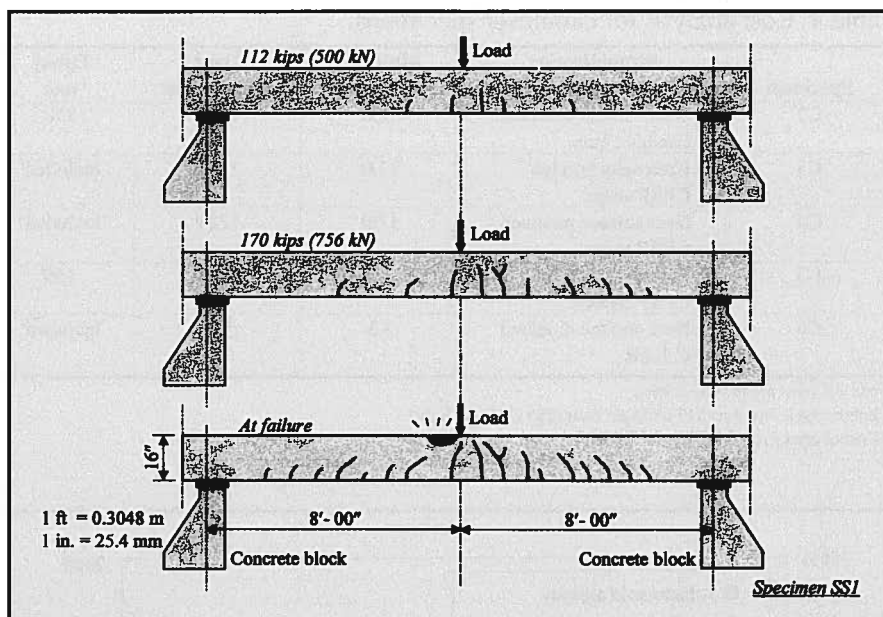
Typical crack pattern development for strengthened simply supported specimens.
